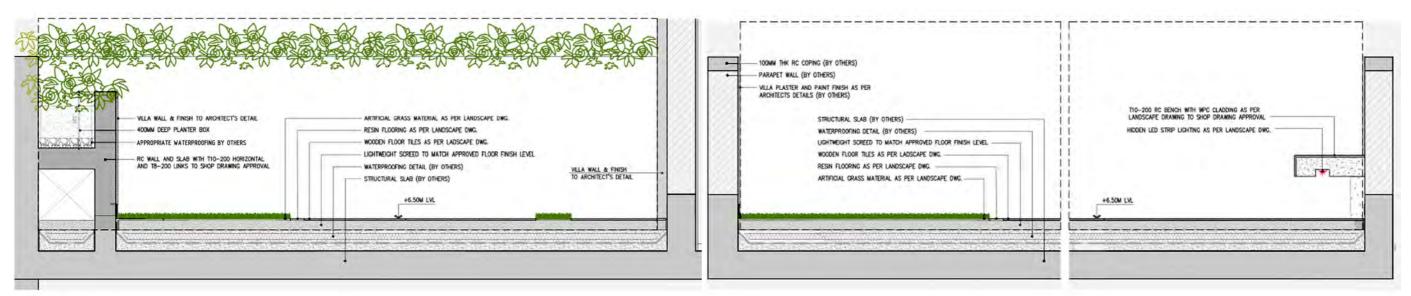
Reference section for Hard Landscaping at First Floor Terrace
